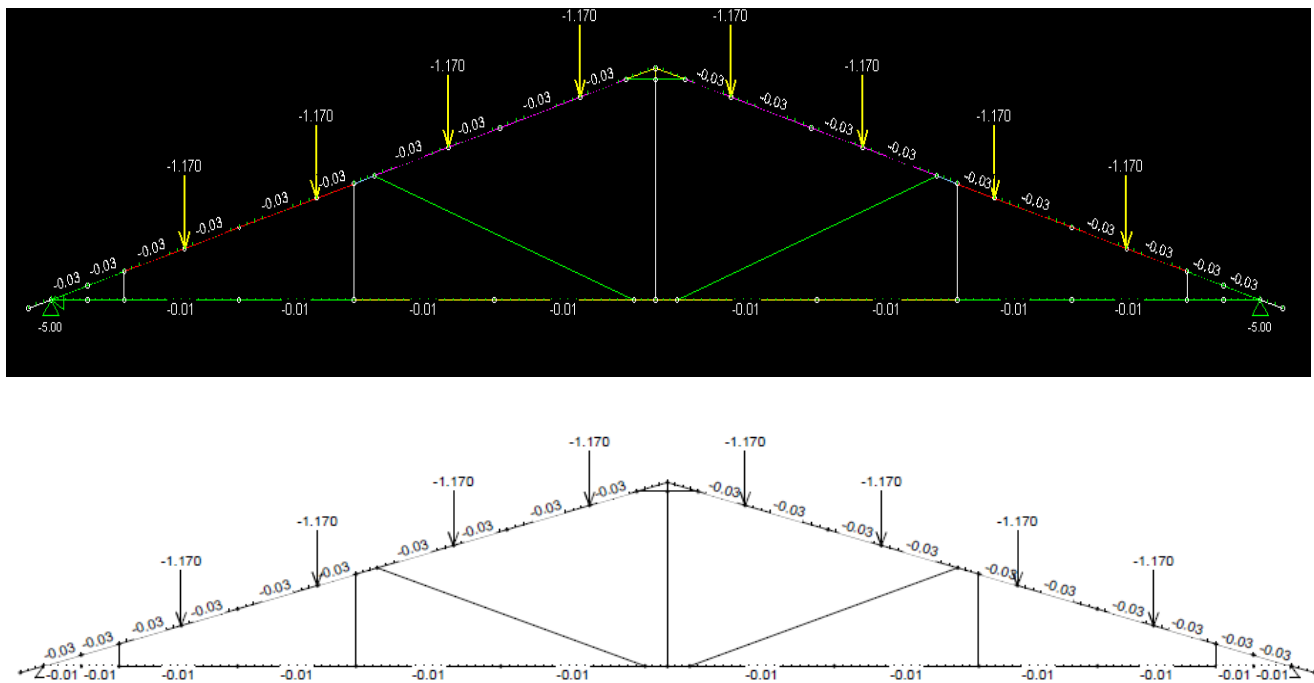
Axial diagram of Truss Design Capacity with roof battens at 400mm spacing
